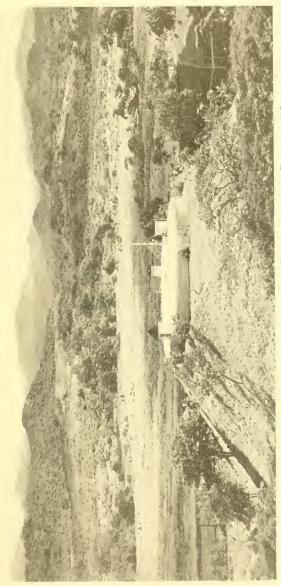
, — Low Service Reservoir After Construction of Roof in 1921.
